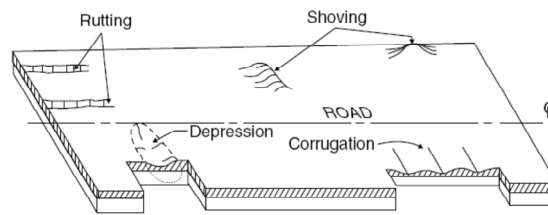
Sketch of deformation in flexible pavements (Austroads, 1987)
